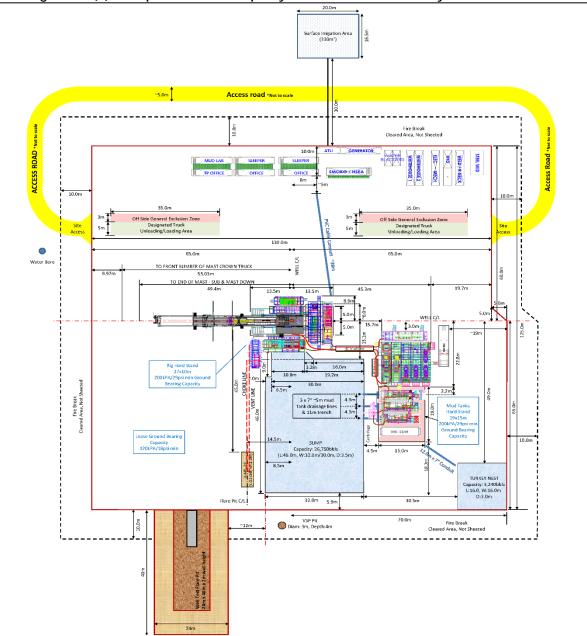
(d) - Proposed Drill Camp Layout - Lot 100 Strawberry North East Road
